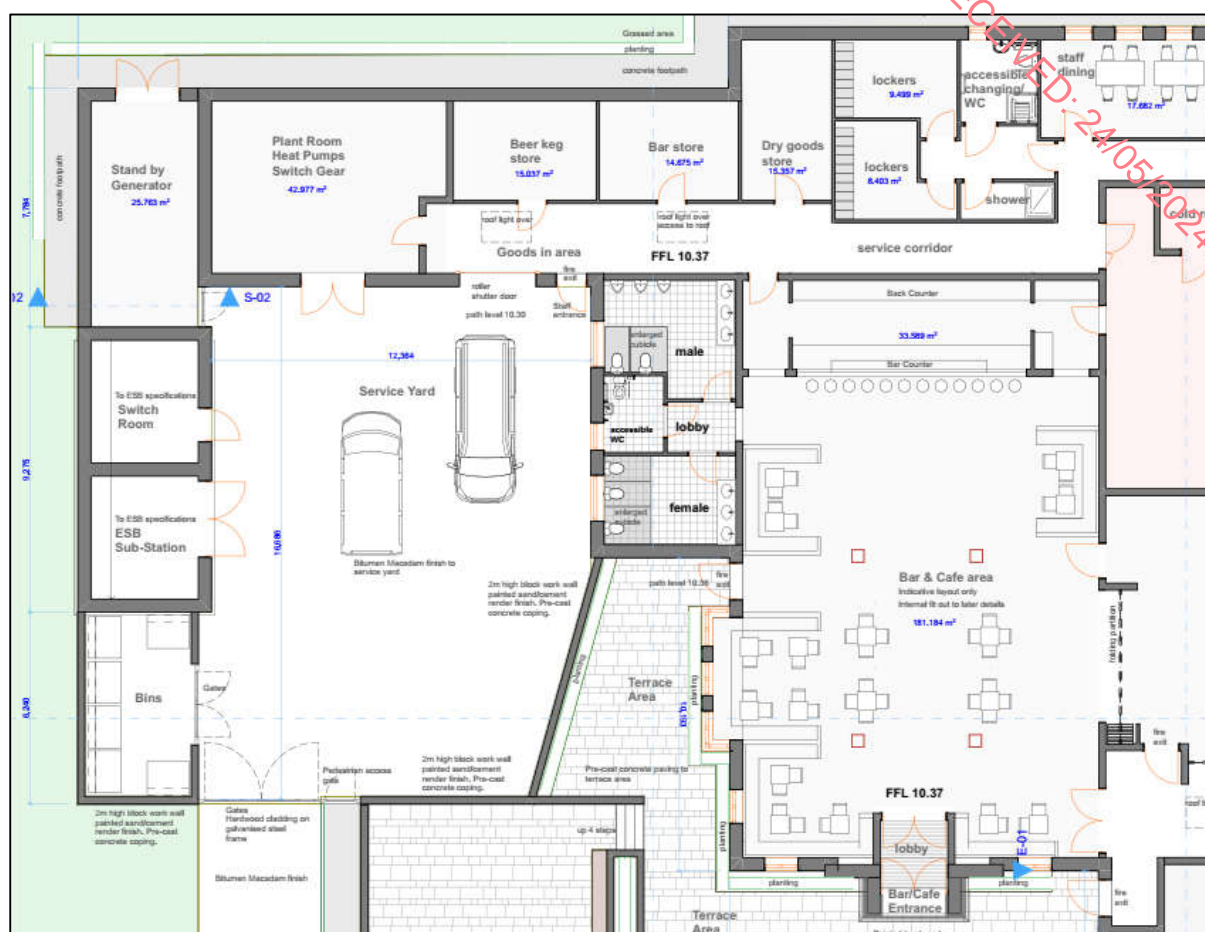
North-east section of the Hotel Ground Floor Plan indicating the location of the ESB substation and adjacent Switch Room and Backup Generator rooms for the proposed development.
